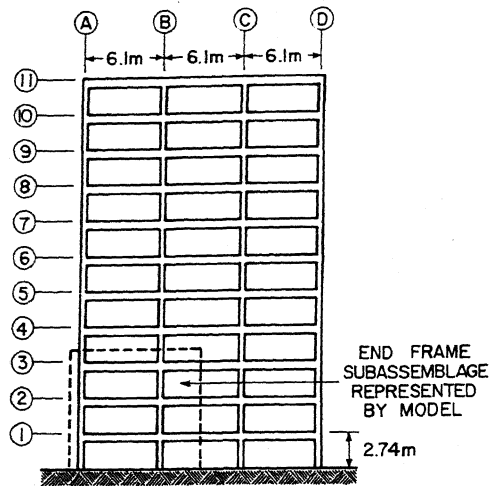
END FRAME ELEVATION - PROTOTYPE
